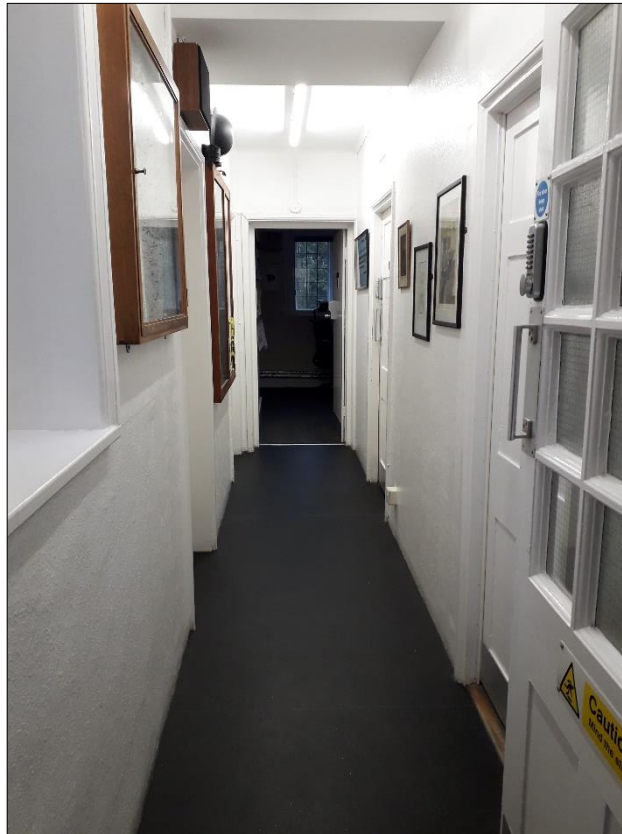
room 01-104, showing general arrangement, looking towards door to room 01-103 [29.08.2023]
